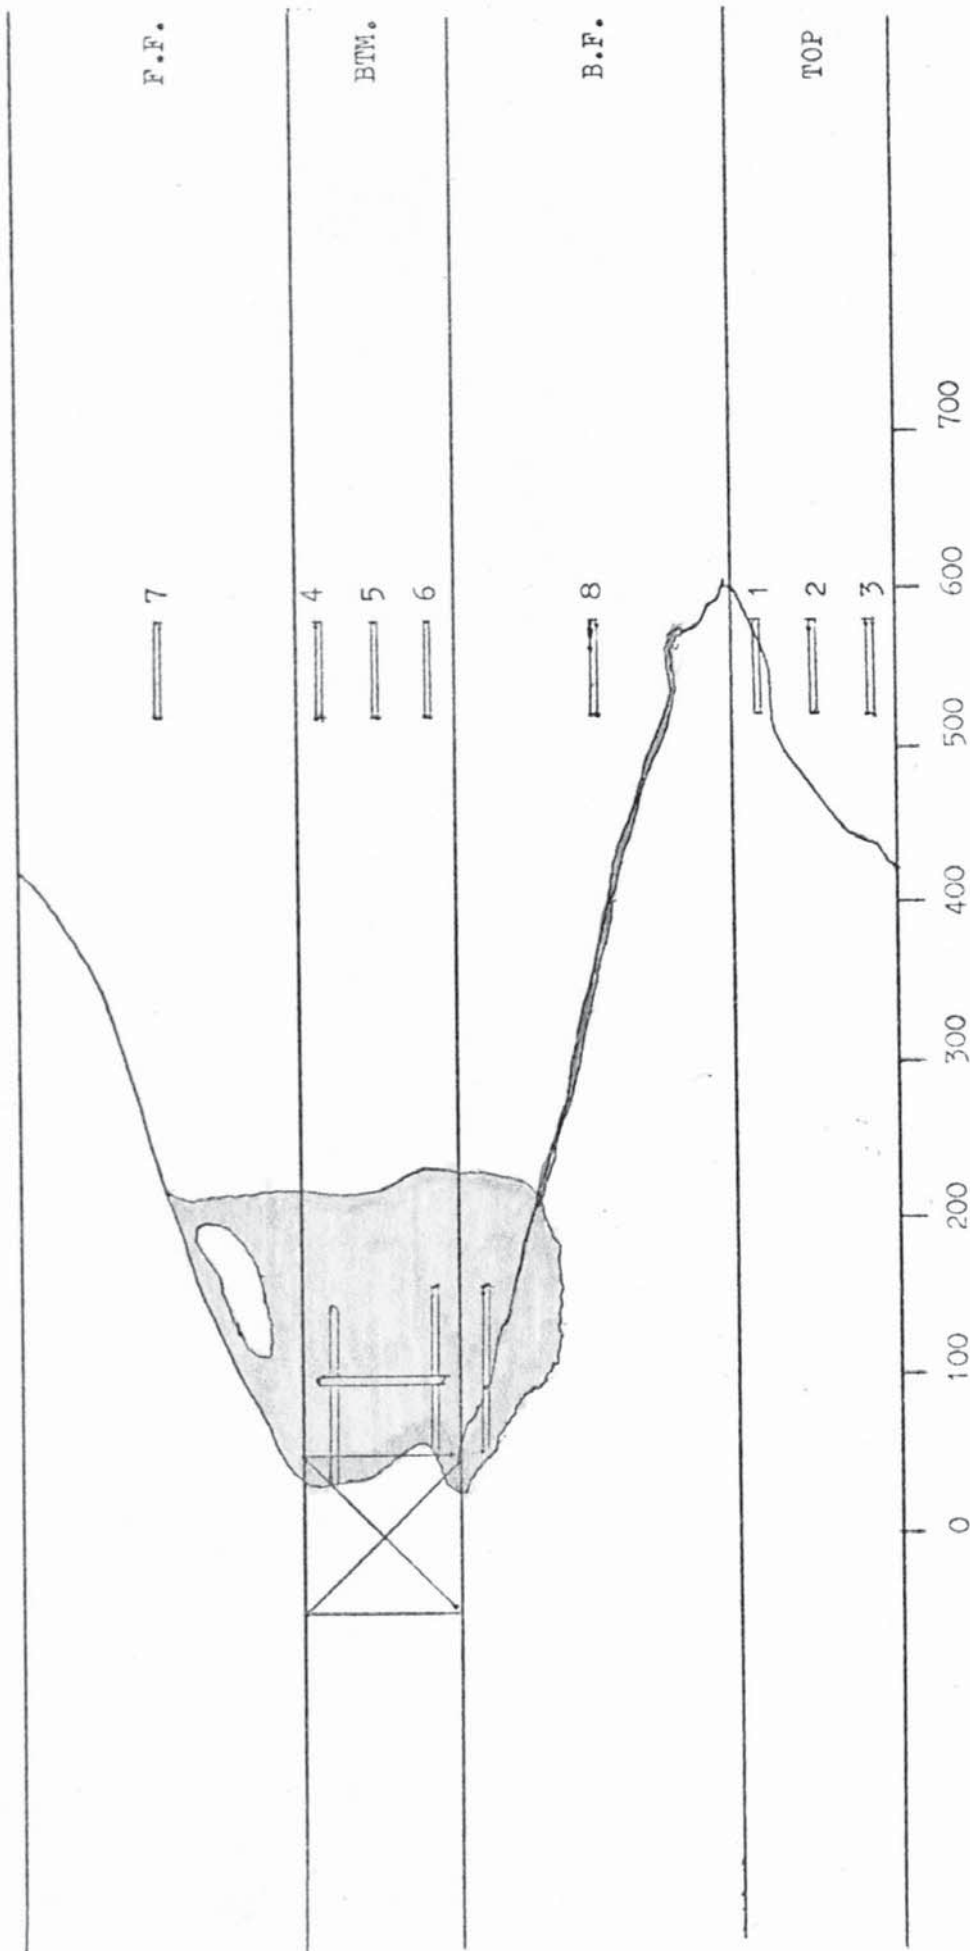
FAILURE CRACK PATTERNS - BEAM 7 (MODE 2)
